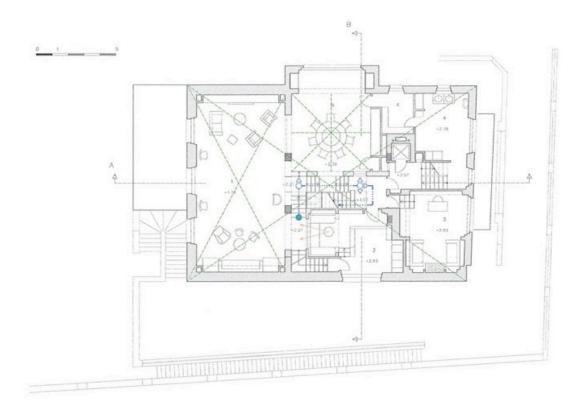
First Floor Plans of Muller House by Adolf Loos. Source: http://www.mullerovavila.cz
